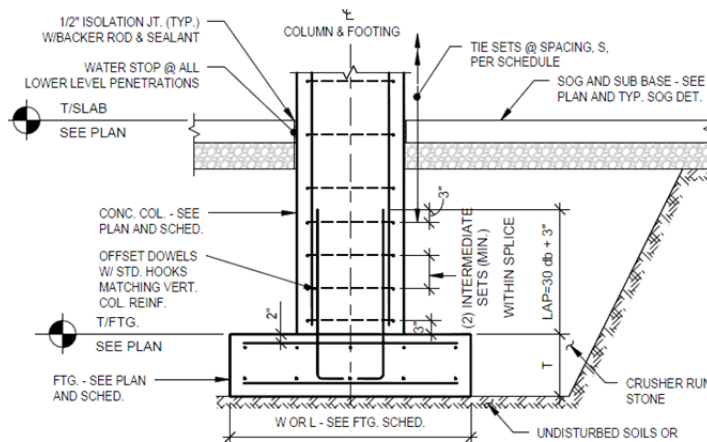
TYPICAL COLUMN FOOTING SHOWING REINFORCEMENT PLACEMENT
